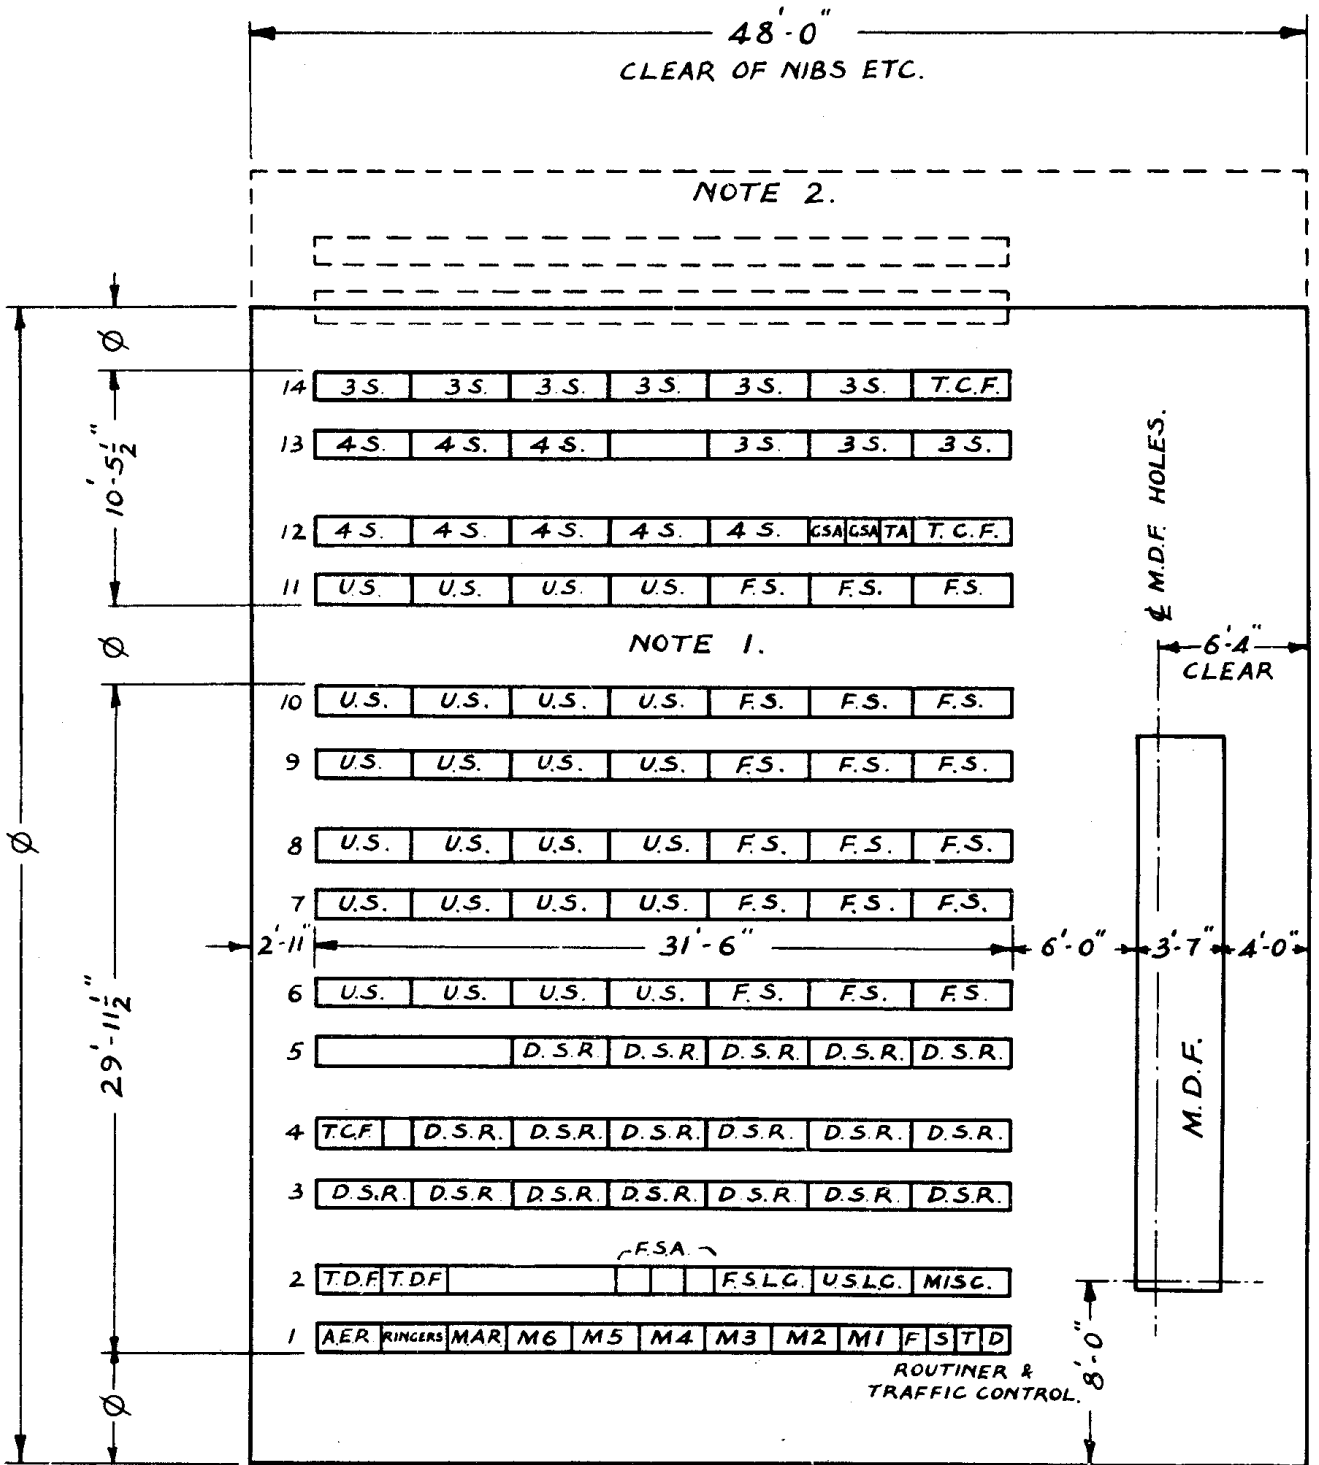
TYPICAL BRANCH EXCHANGE LAYOUTS.
